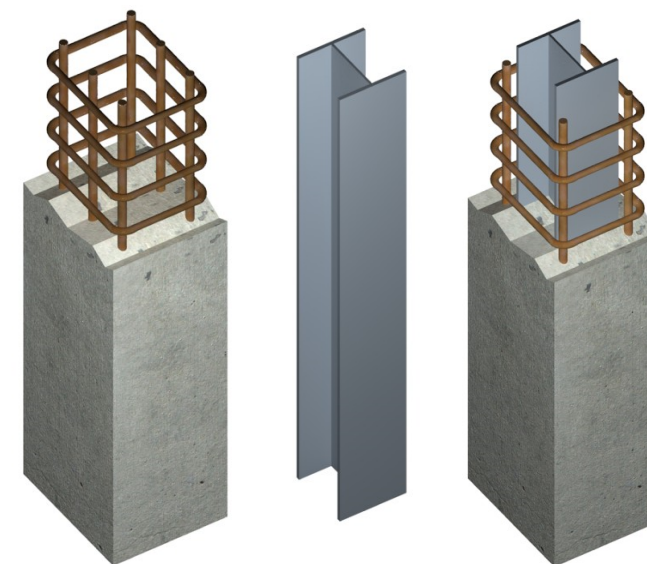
Column types a) RC column, b) Steel column, c) Composite column
